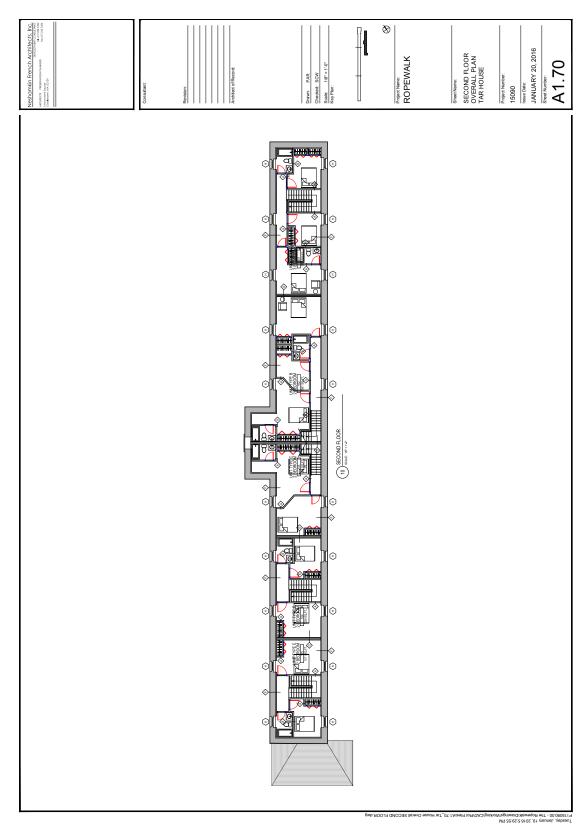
NCP 2<sup>nd</sup> Floor Plan - Tar House
